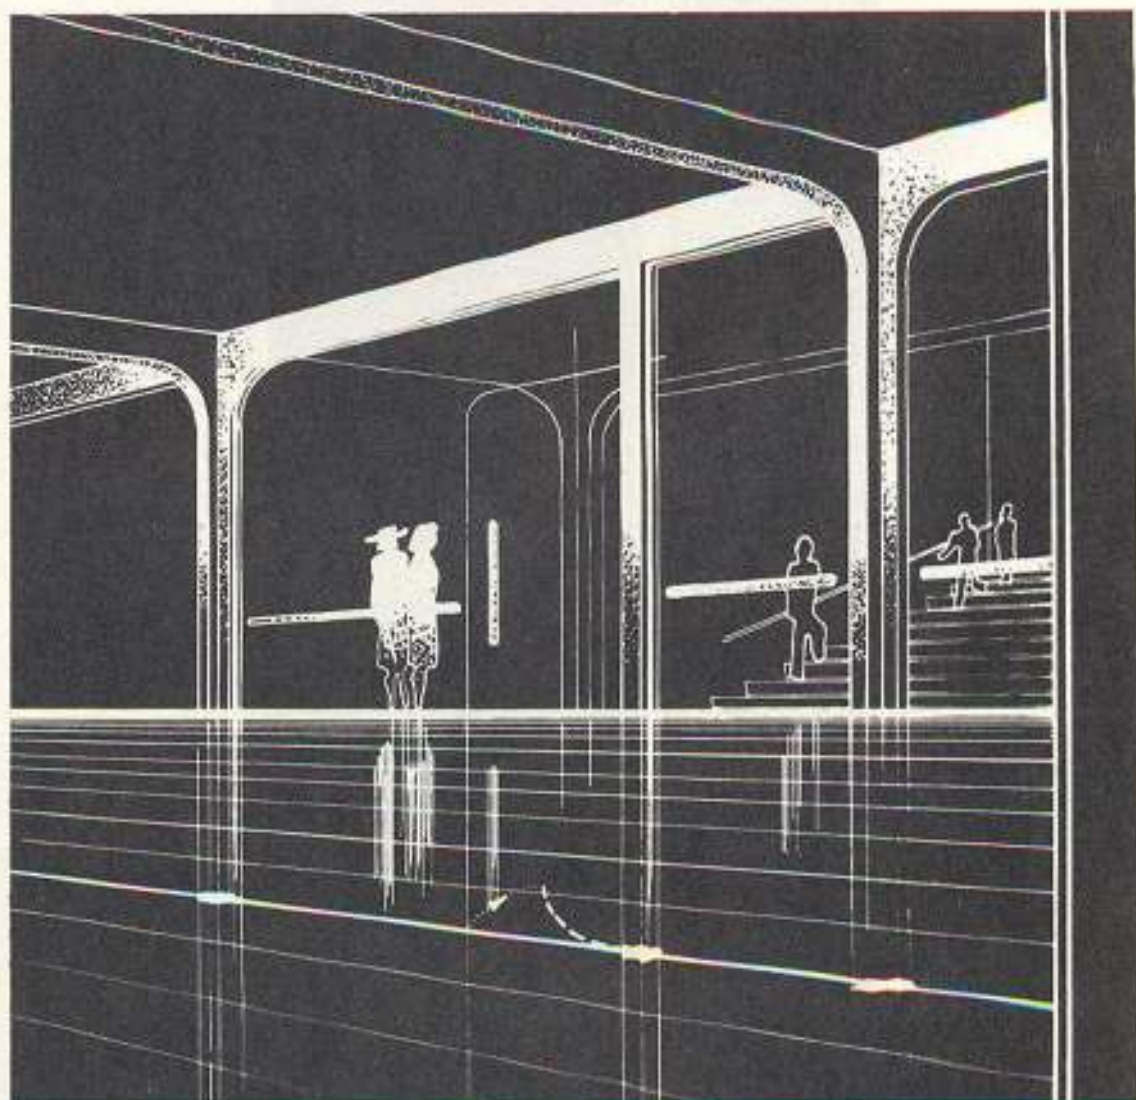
Perspective of an entrance to a building, with a flexible door
